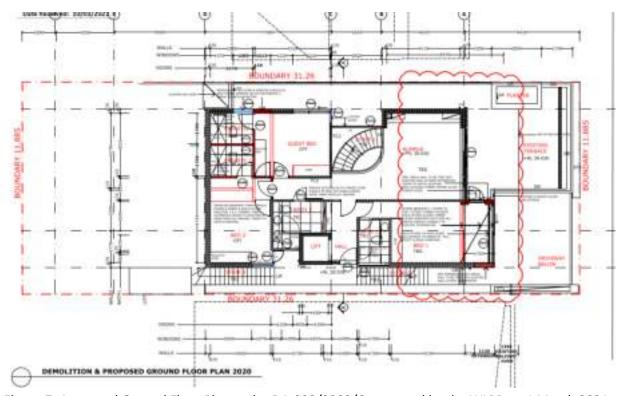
Approved Ground Floor Plan under DA-829/2003/C approved by the WLPP on 1 March 2021
